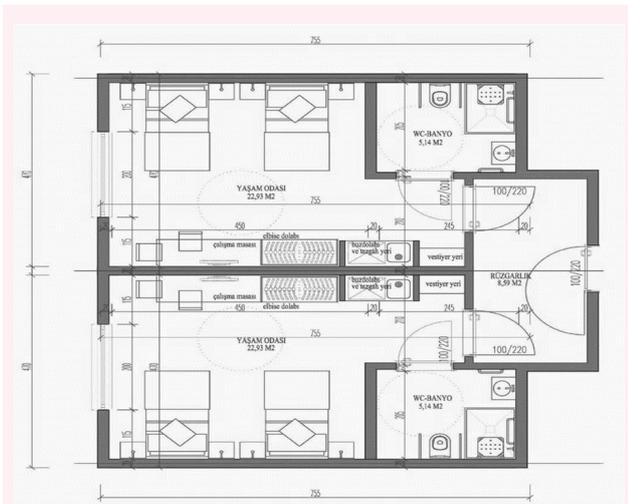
Prefabricated House Plan (Akyıldız et al., 2018)
